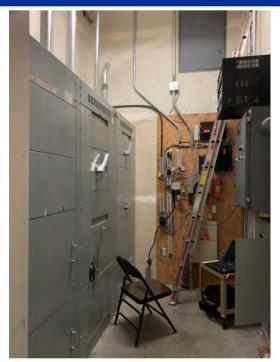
Electrical room in multi-purpose/gym at southwest corner of building
